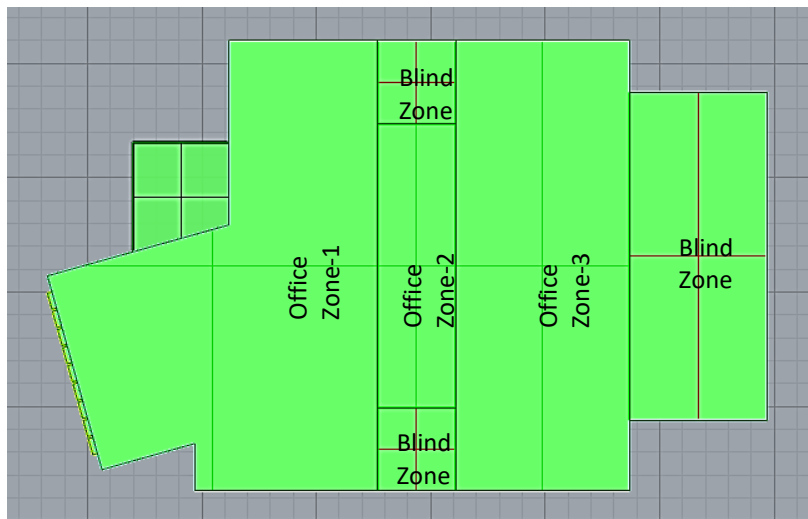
Thermal zones of the study area identified on the 11th floor plan.
